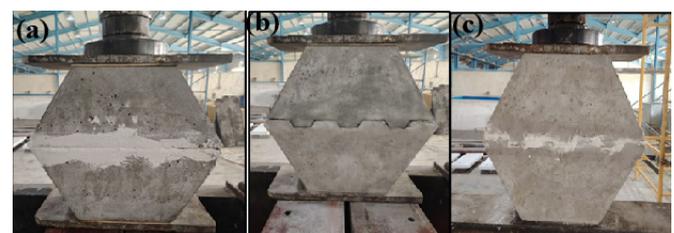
Compression test for stacked block units (a) Hexagonal blocks with bonding material, B3, (b) hexagonal blocks with mechanical bonding, B4, (c) mechanical bonding techniques with bonding material, B5.
